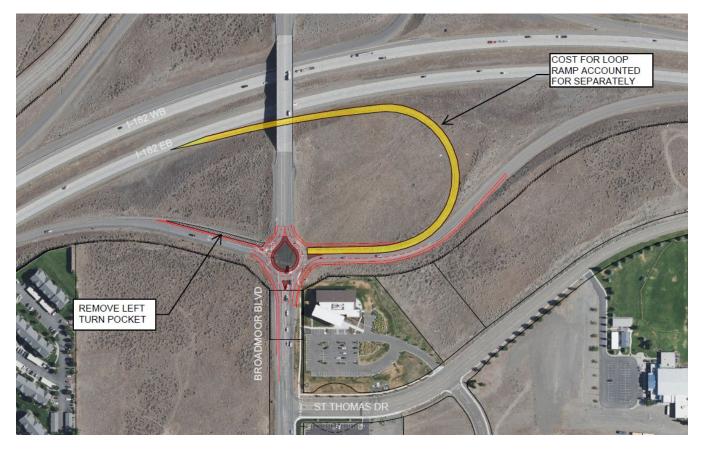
ALTERNATIVE E-R-1 (ROUNDABOUT + LOOP RAMP) CONCEPTUAL LAYOUT
